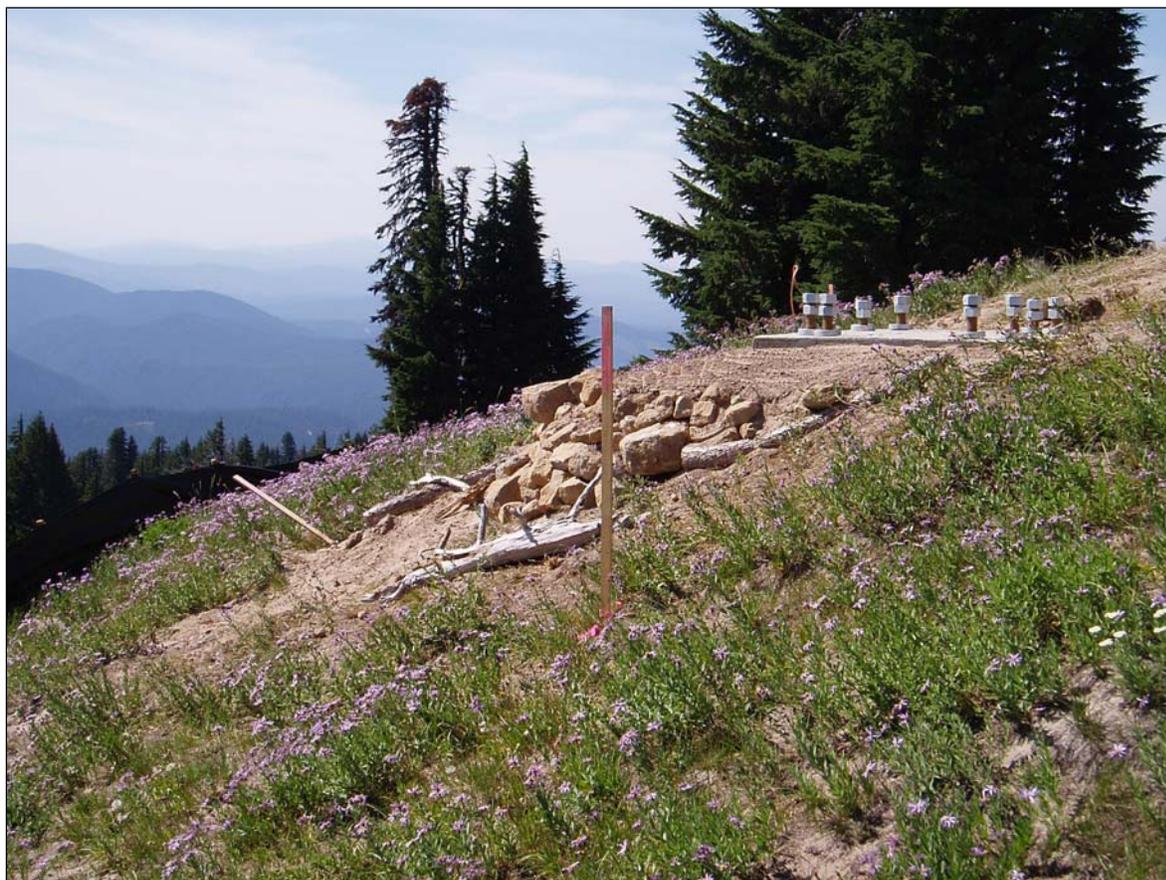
Close-up post construction view of the lift tower shown in the previous photo above.
